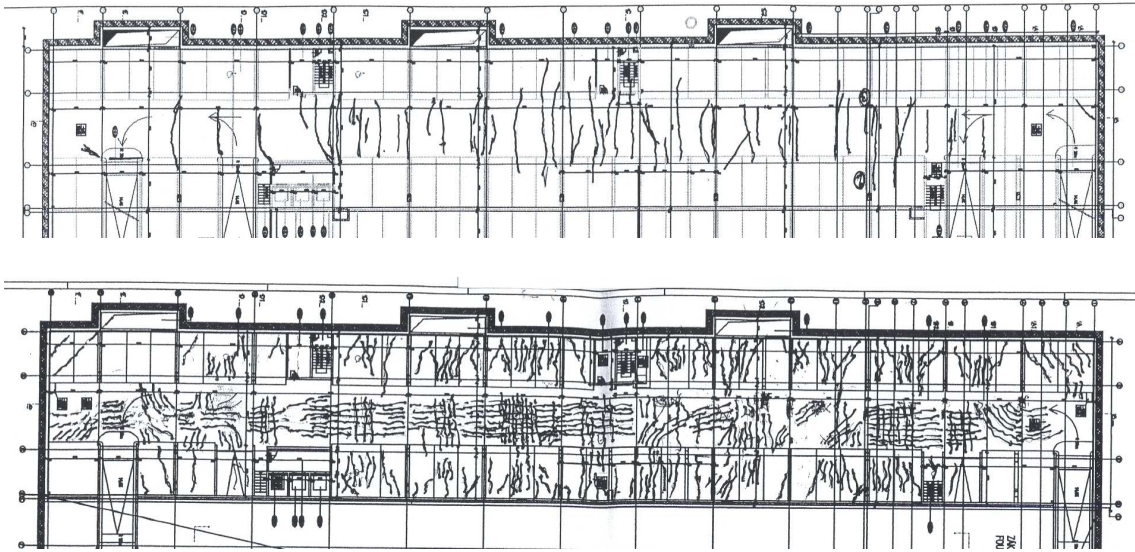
Cracks in the bottom surface of the floor slab (thickness 220 mm, average crack width 0.2 mm); cracking caused by concreting in hot weather and by keeping the structure unsheltered for 3 years.
